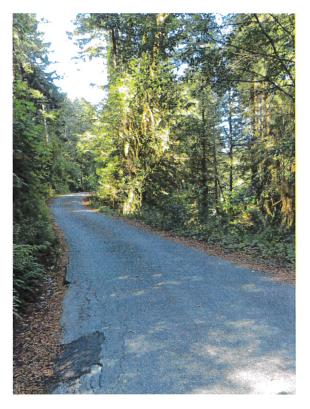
Milepost 0.42. Start of vertical curve. Road grade increases to adverse. Broken pavement on lieft.
